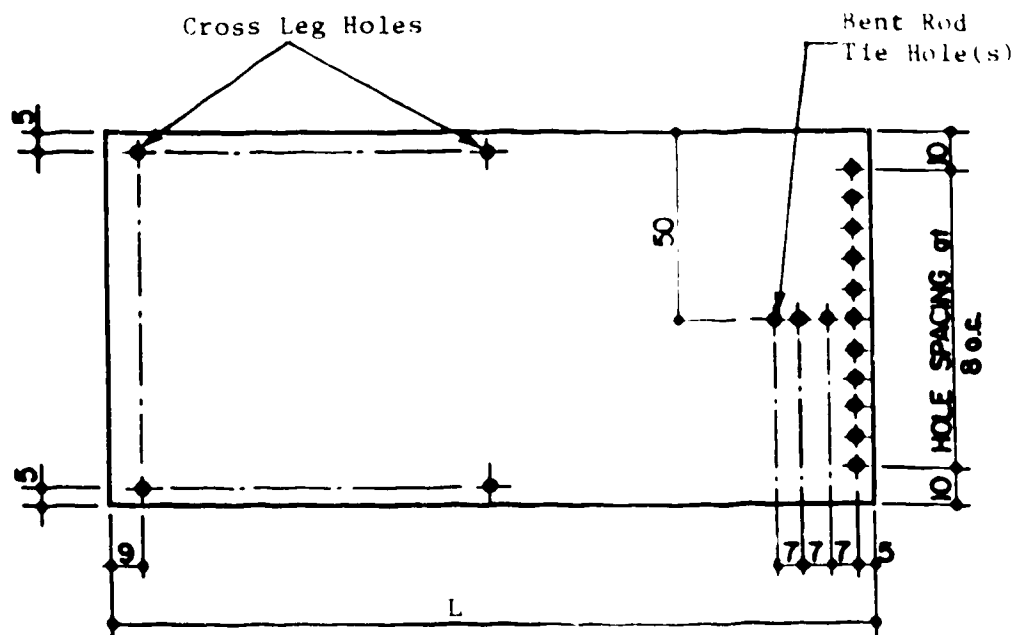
Concrete Block Unit Dimensions - 200 mm
